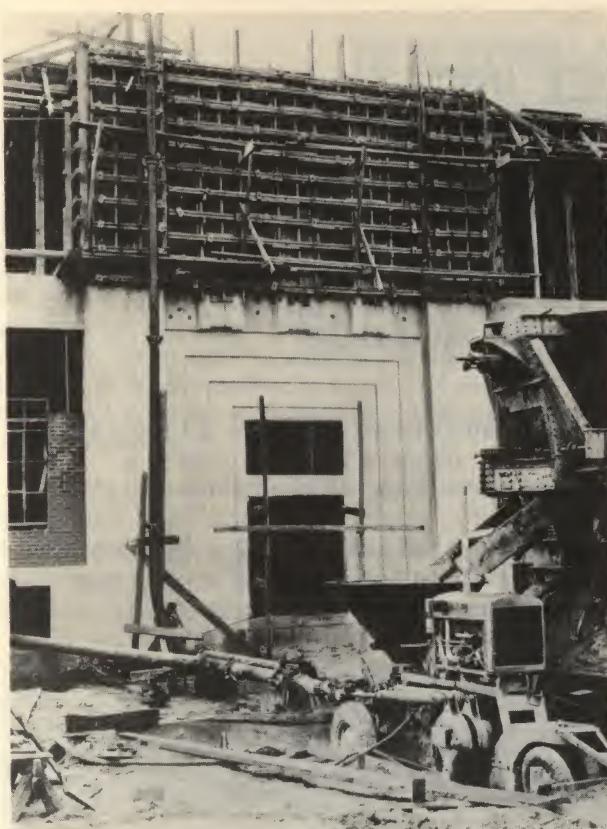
Model 160 setup under paver. The John G. Yerington Company placed 8000 cubic yards in this 4-story cold storage warehouse for the House of David colony, Benton Harbor, Michigan. With two pipelines in place, one to the top of the forms and one to the basement, the contractor alternated his pumping and maintained an almost steady placement program; pouring up to 200 cubic yards daily.
